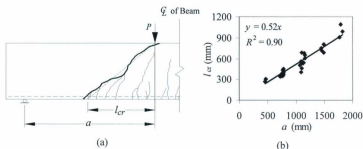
(a) Failure crack location at the bottom of the beam, and (b) failure crack location versus shear span ratio
